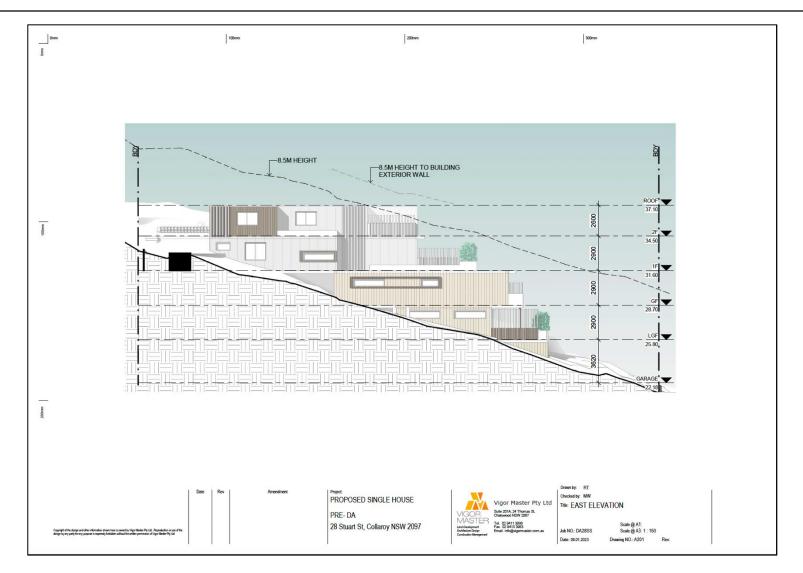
ILLUSTRATES PROPOSED EAST ELEVATION
